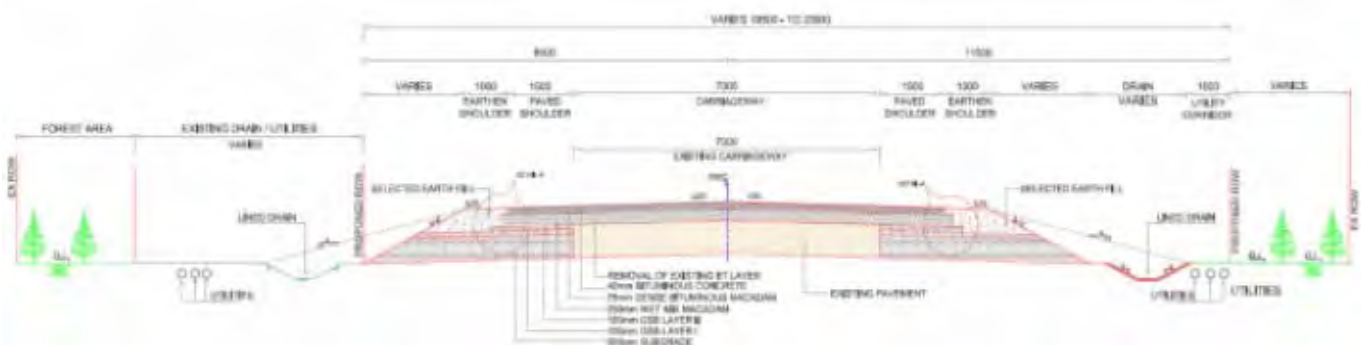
C5 –R-P- Two Lane Carriageway Paved Shoulder in Forest Area
